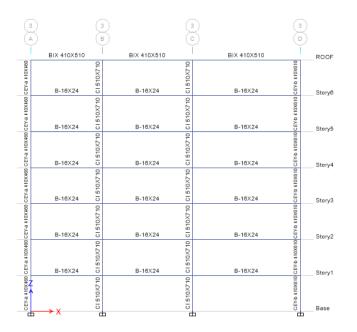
Grid 3A,3B,3C and 3D Column Position Layout
